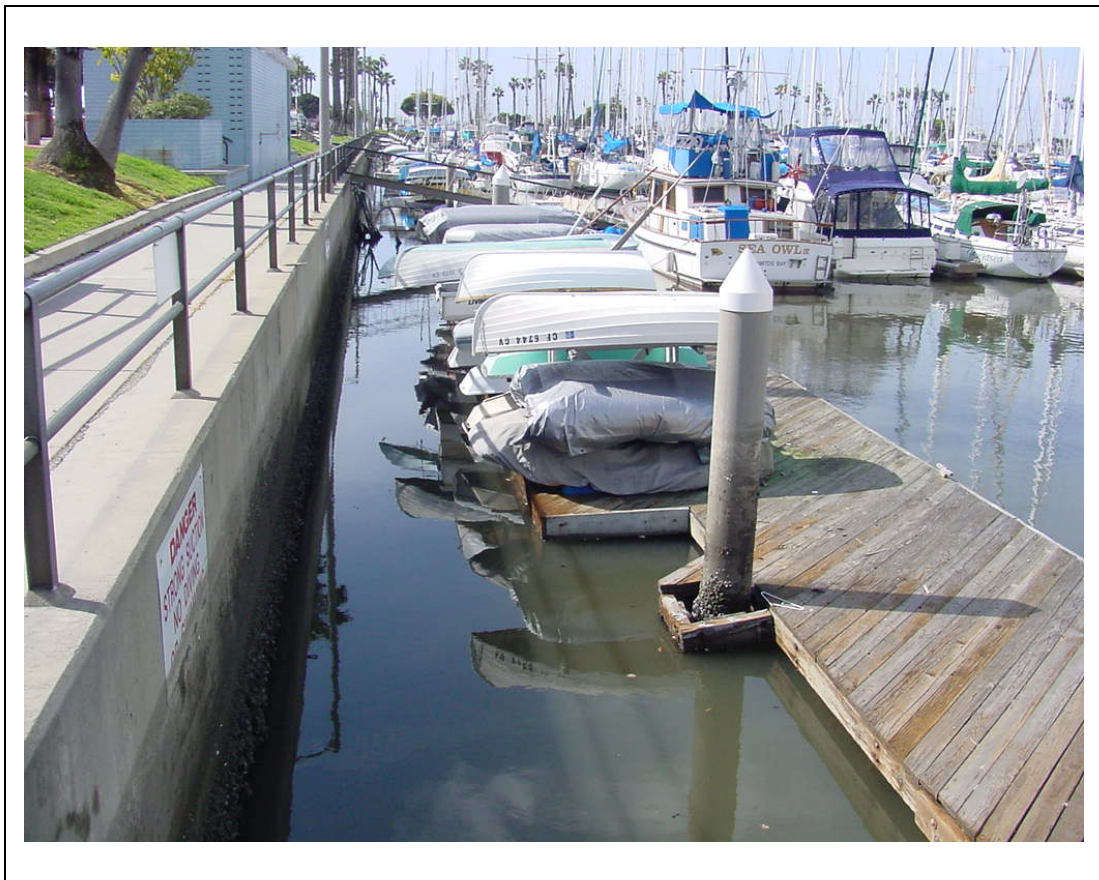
View of Long Beach Marina and HnGS intake structure below water surface along concrete bulkhead.
